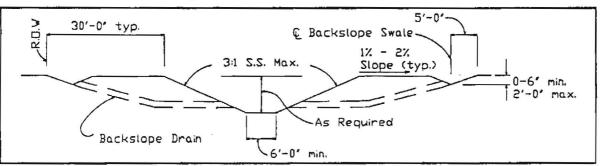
Typical Section - Grass-Lined Trapezoidal Channel
